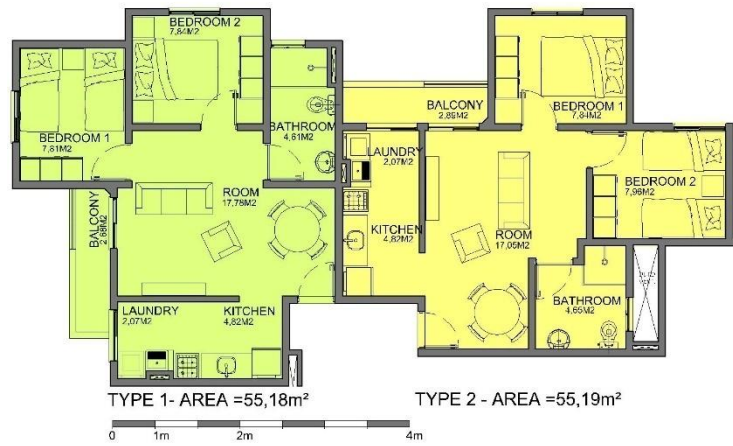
Floor plan of a housing unit (Type 1 and Type2).
